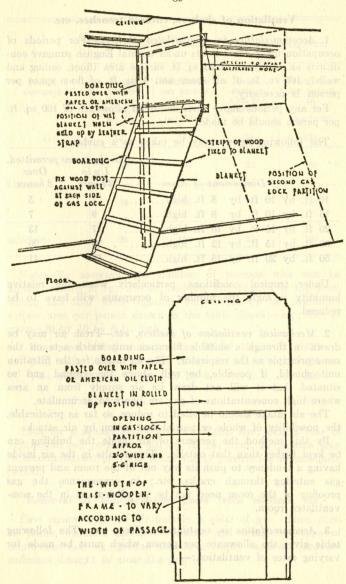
Air lock constructed with blanket screens. Sketch (above) and Elevation (below).
